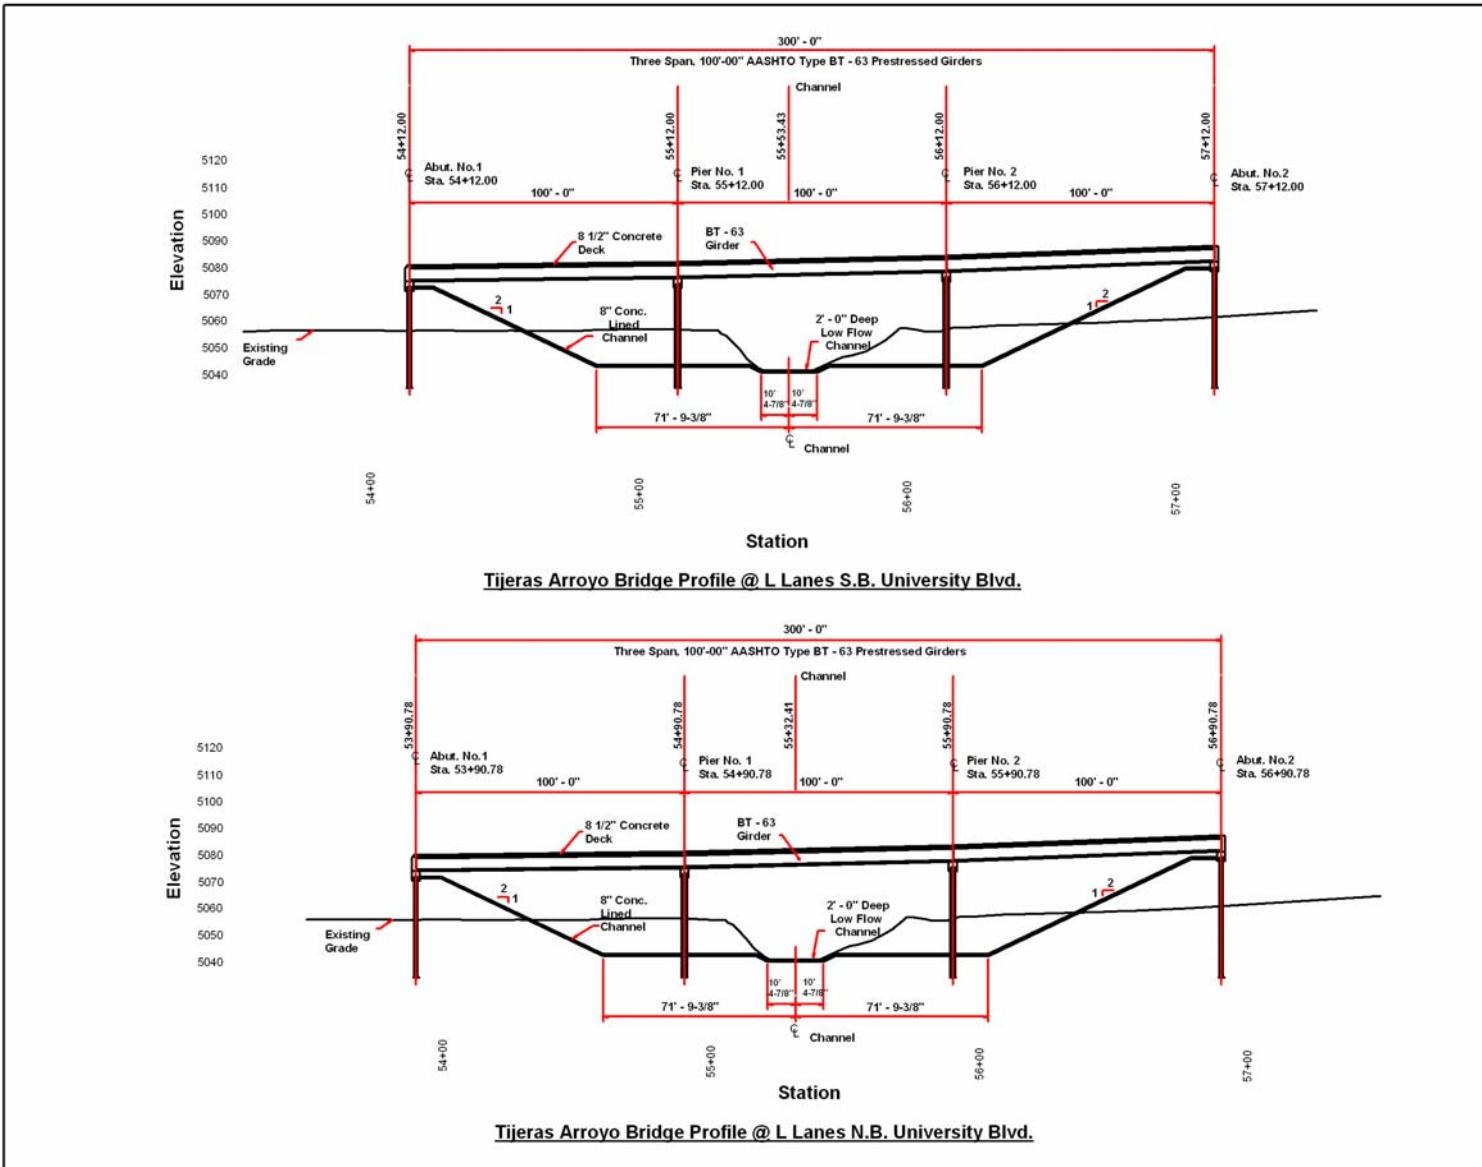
Profile view of proposed University Boulevard bridge crossing of Tijeras Arroyo.
